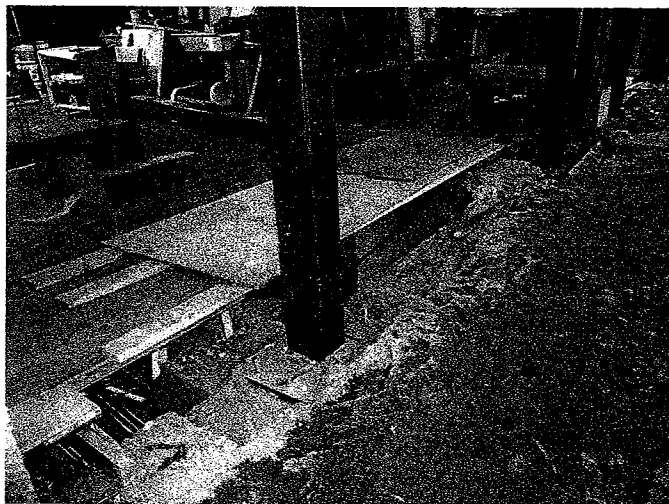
Front entrance slab preparation at grid A/3.5.
